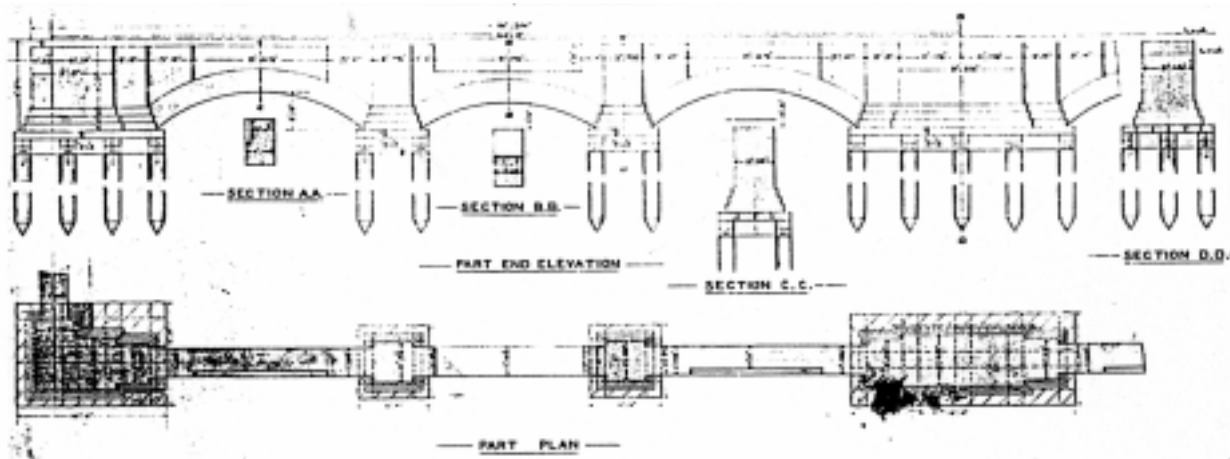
Foundations, part plan and elevation showing the timber piles. Source: Extract from plan from SRAO ELW 2.
